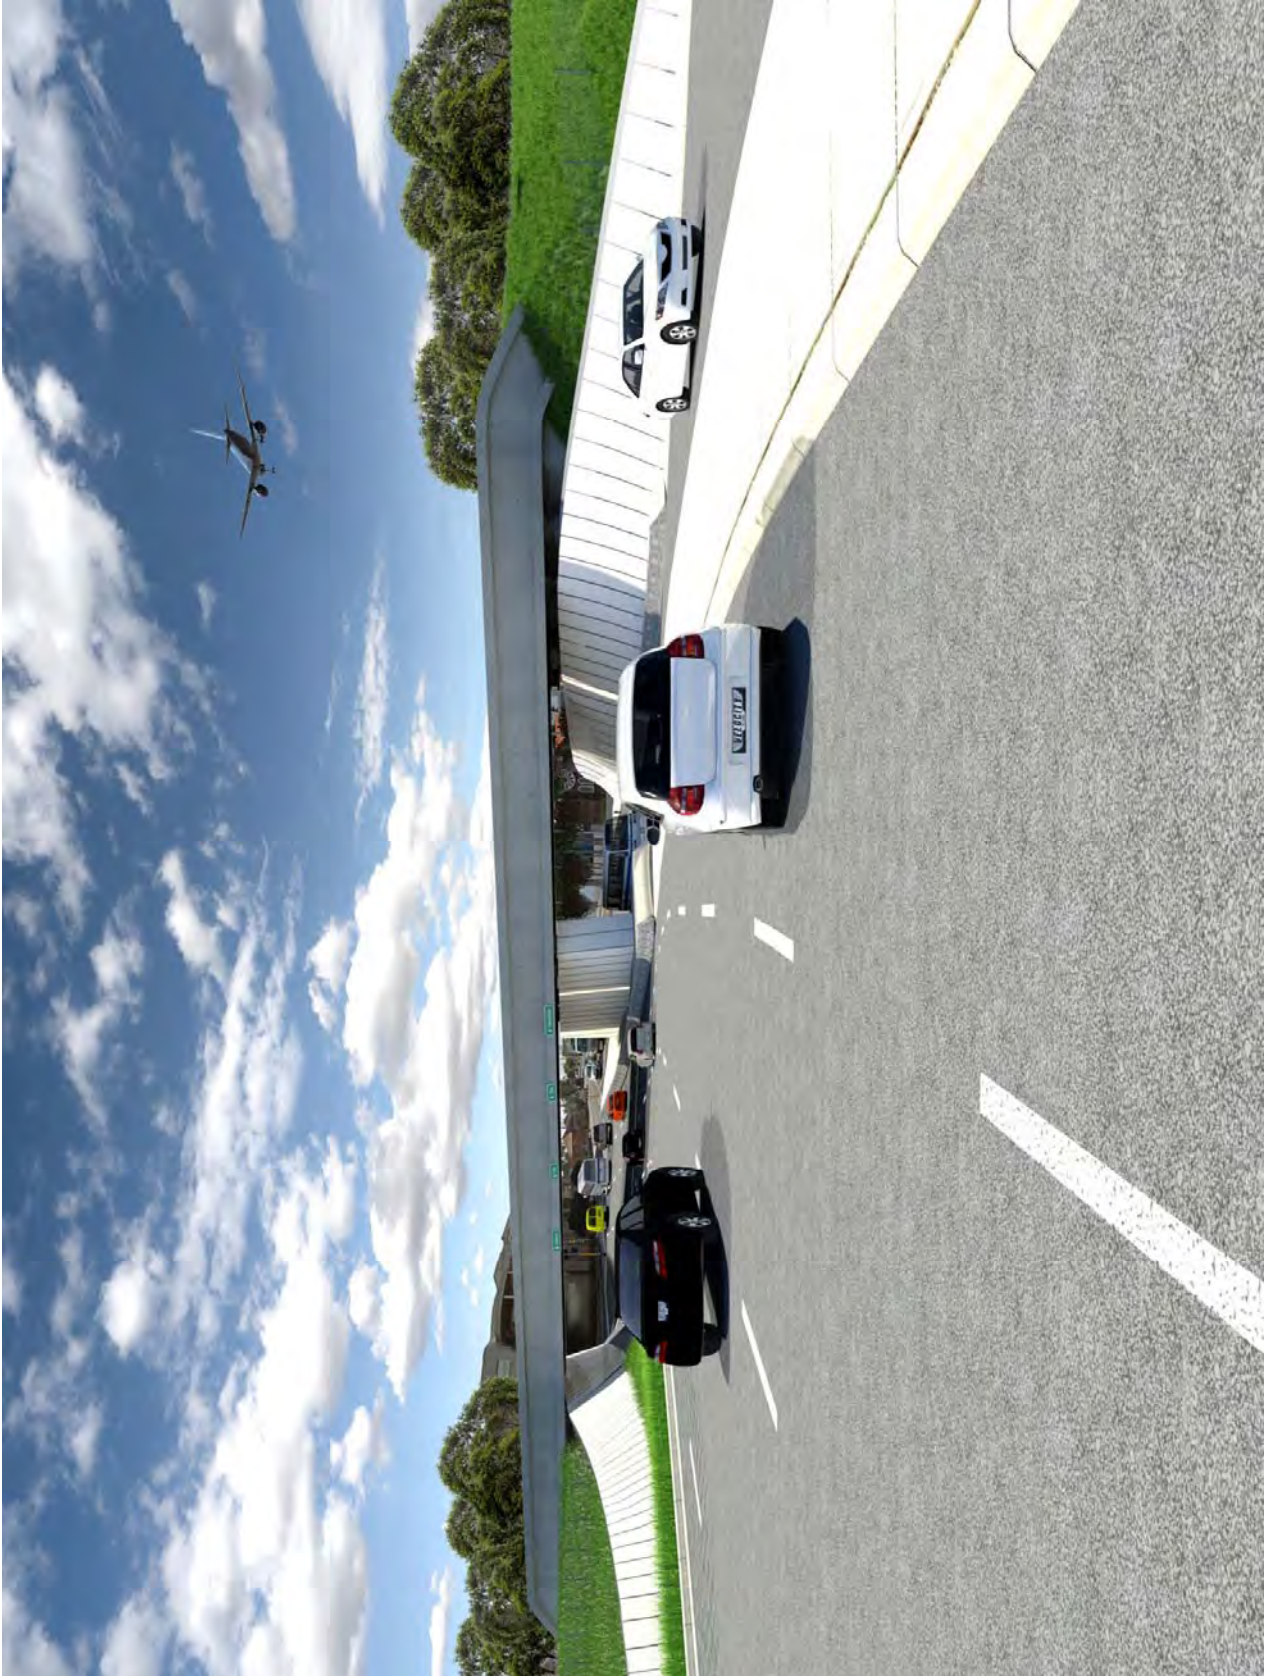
Artist's impression of the new rail bridge over Wentworth Avenue (subject to consultation and design refinement)
